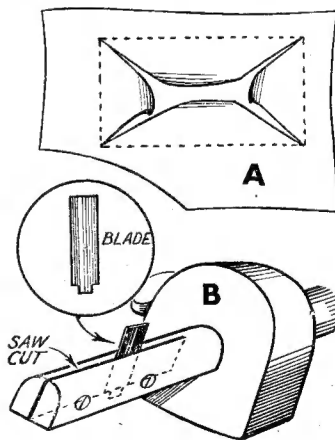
A—Method of cutting building paper for window openings. B—Special blade fitted to marking-gauge for marking window sash-bars
